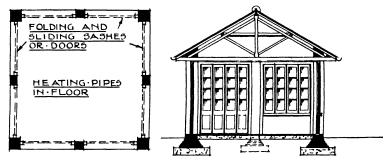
Plan and section of detached open-air class-room fitted on each side with sashes or, alternatively, doors of full height.
